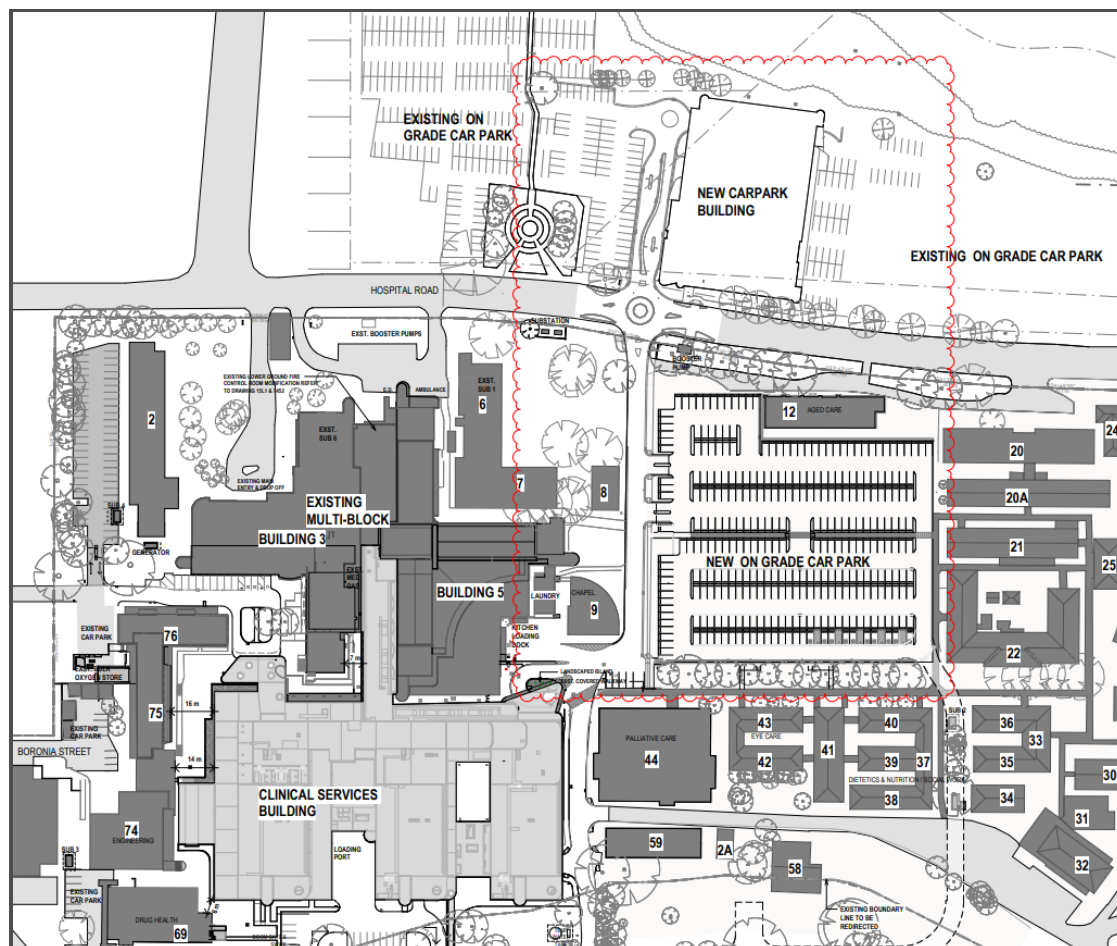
| Hospital campus layout and modification area shown in red cloud (Source: Applicant's architectural plans)
